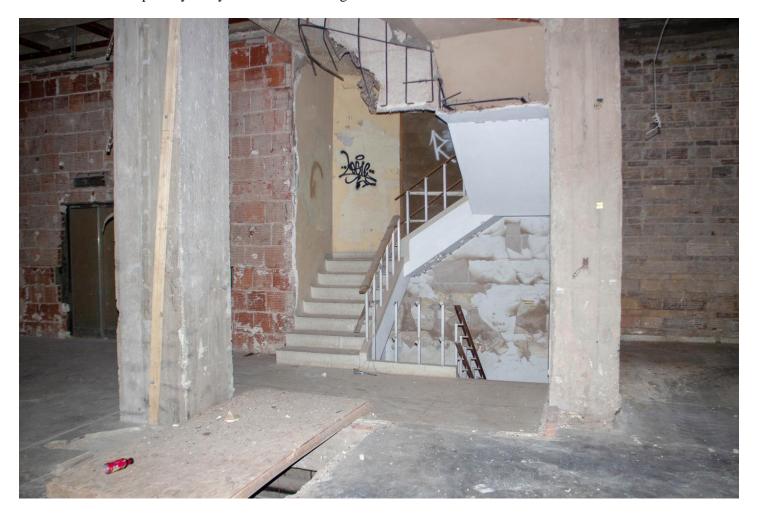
Detail view of Caen stone plaster treatment fragment. Camera facing west at stair.
